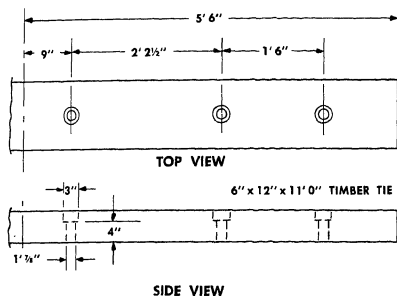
Details of railway tie for eight-truss bridge showing chord bolt holes.
